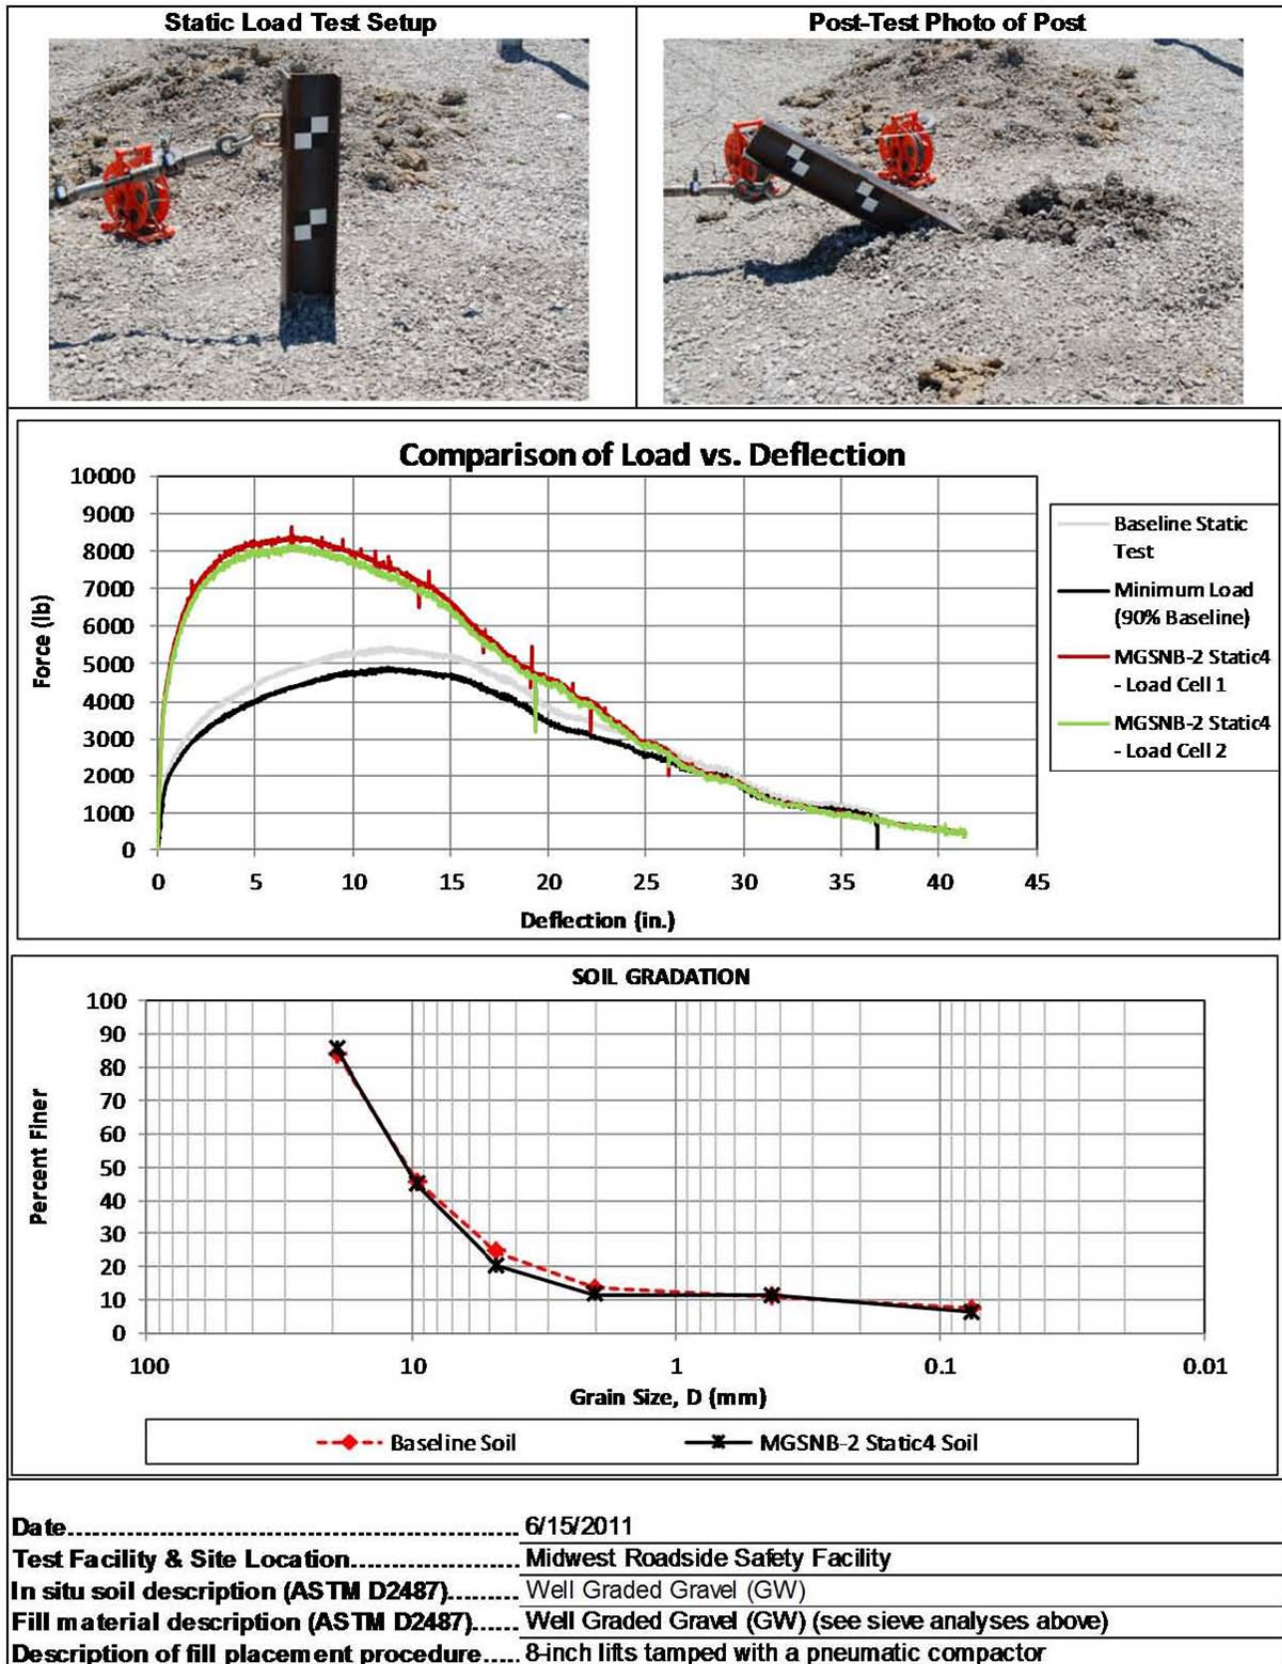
Test Day Static Soil Strength, Test No. MGSNB-2
